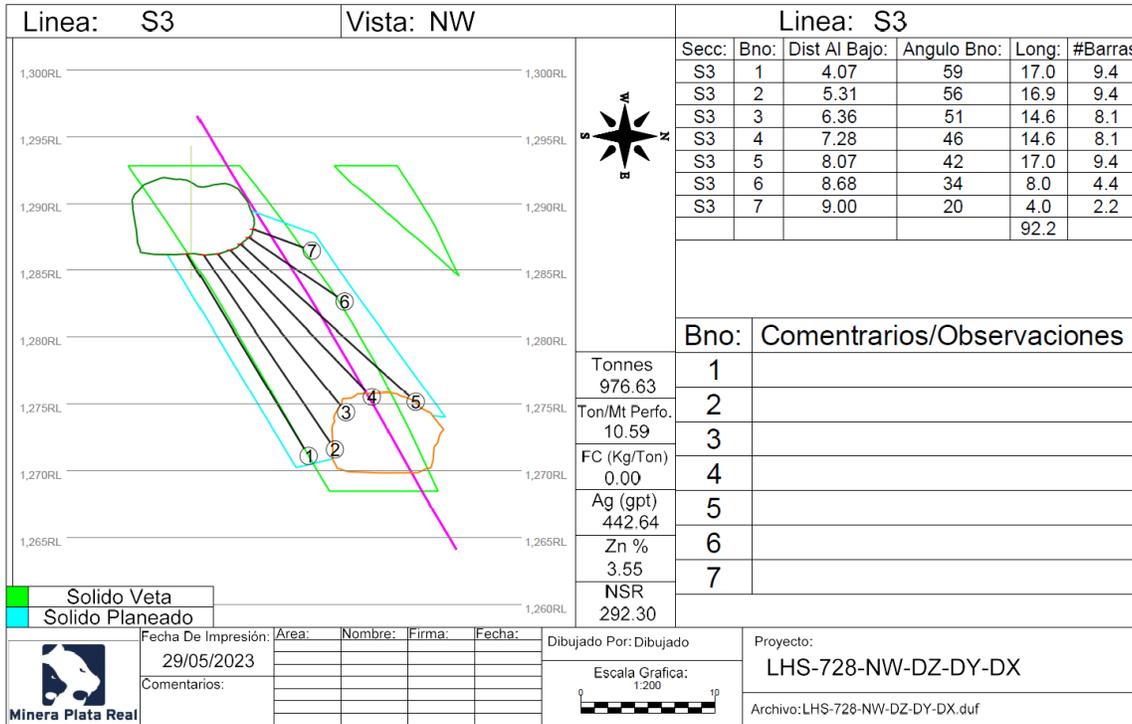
Drilling Layout for Longitudinal Longhole Stope – Section View
